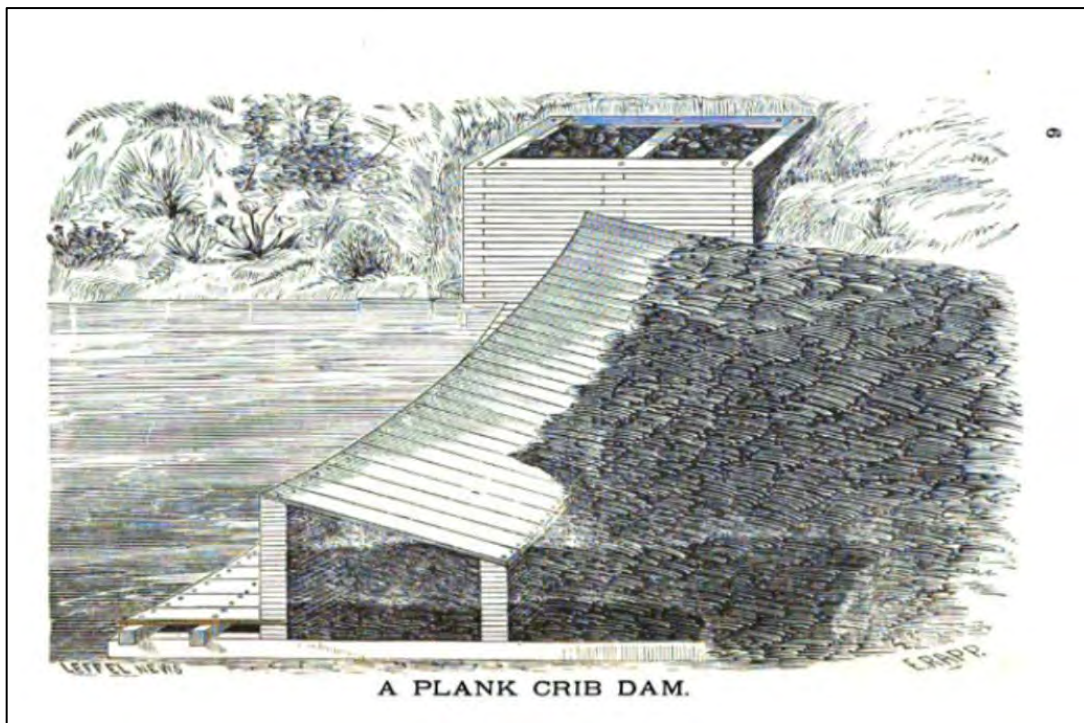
Example of an ascending ramp dam constructed of plank. ("A Plank Crib Dam," James Leffel & Co. *The Construction of Mill Dams*, 1874, page 73)
